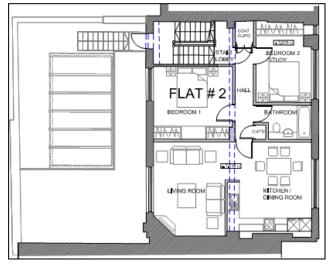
(left): Flat 2 (second floor) 175 Cleveland Street. Similar layout as above without the benefit of a roof terrace.
